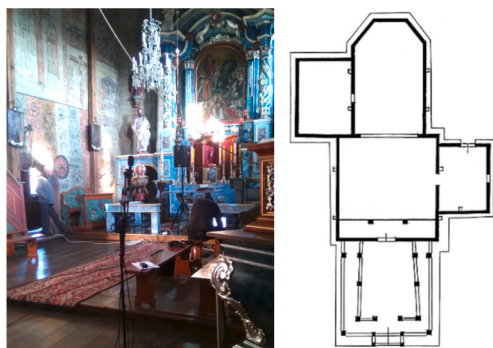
Interior photograph and floor plan of All Saints Church in Blizne.
